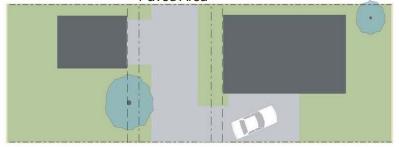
TYPICAL RESIDENTIAL ALLEY CROSS SECTION
